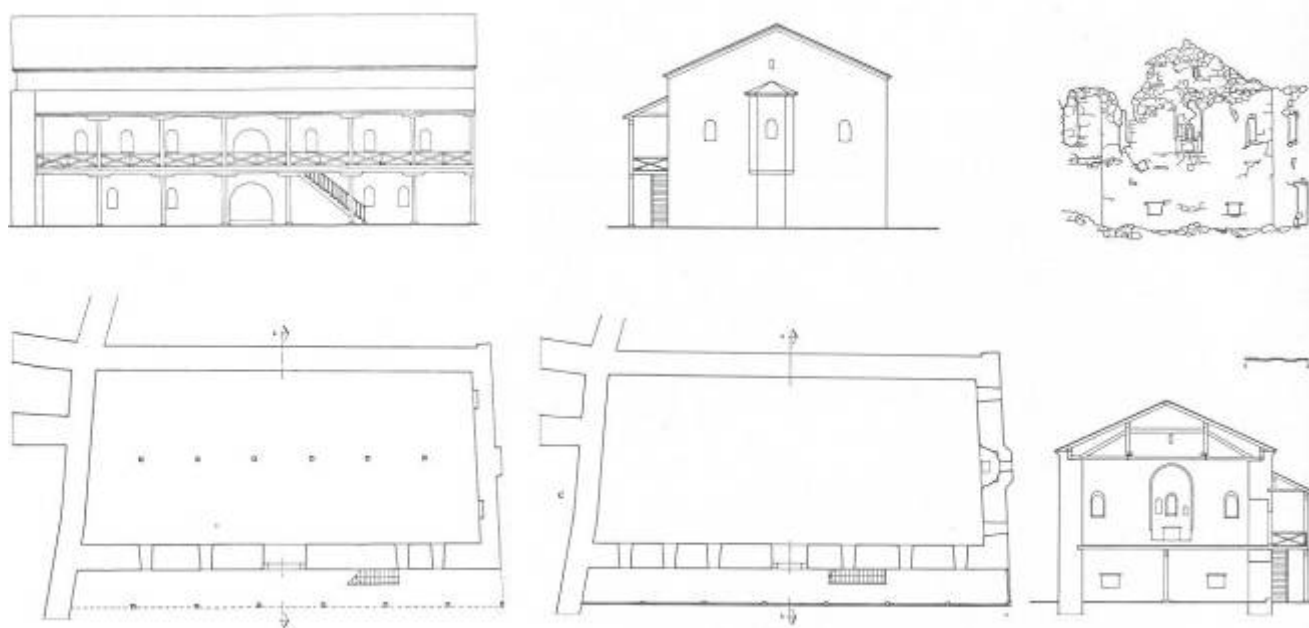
Ideal reconstruction of the original monastery refectory XIV century, today Dionisije's building, main yard north wing: south elevation, east elevation, remains from the XIV century, ground floor, first floor and cross section
